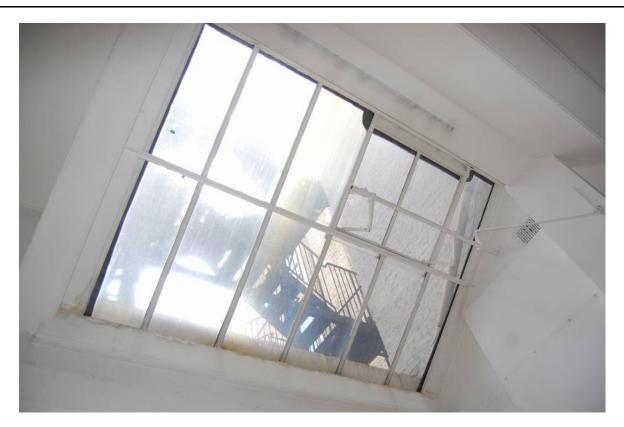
20-23 Long Lane and 22 Lindsey Street, roof light detail
